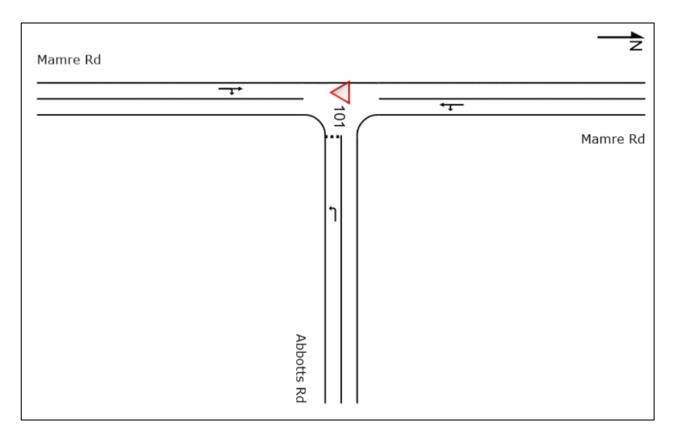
Mamre Road / Abbotts Road Upgrade Layout - Construction Stage 2 & 31
